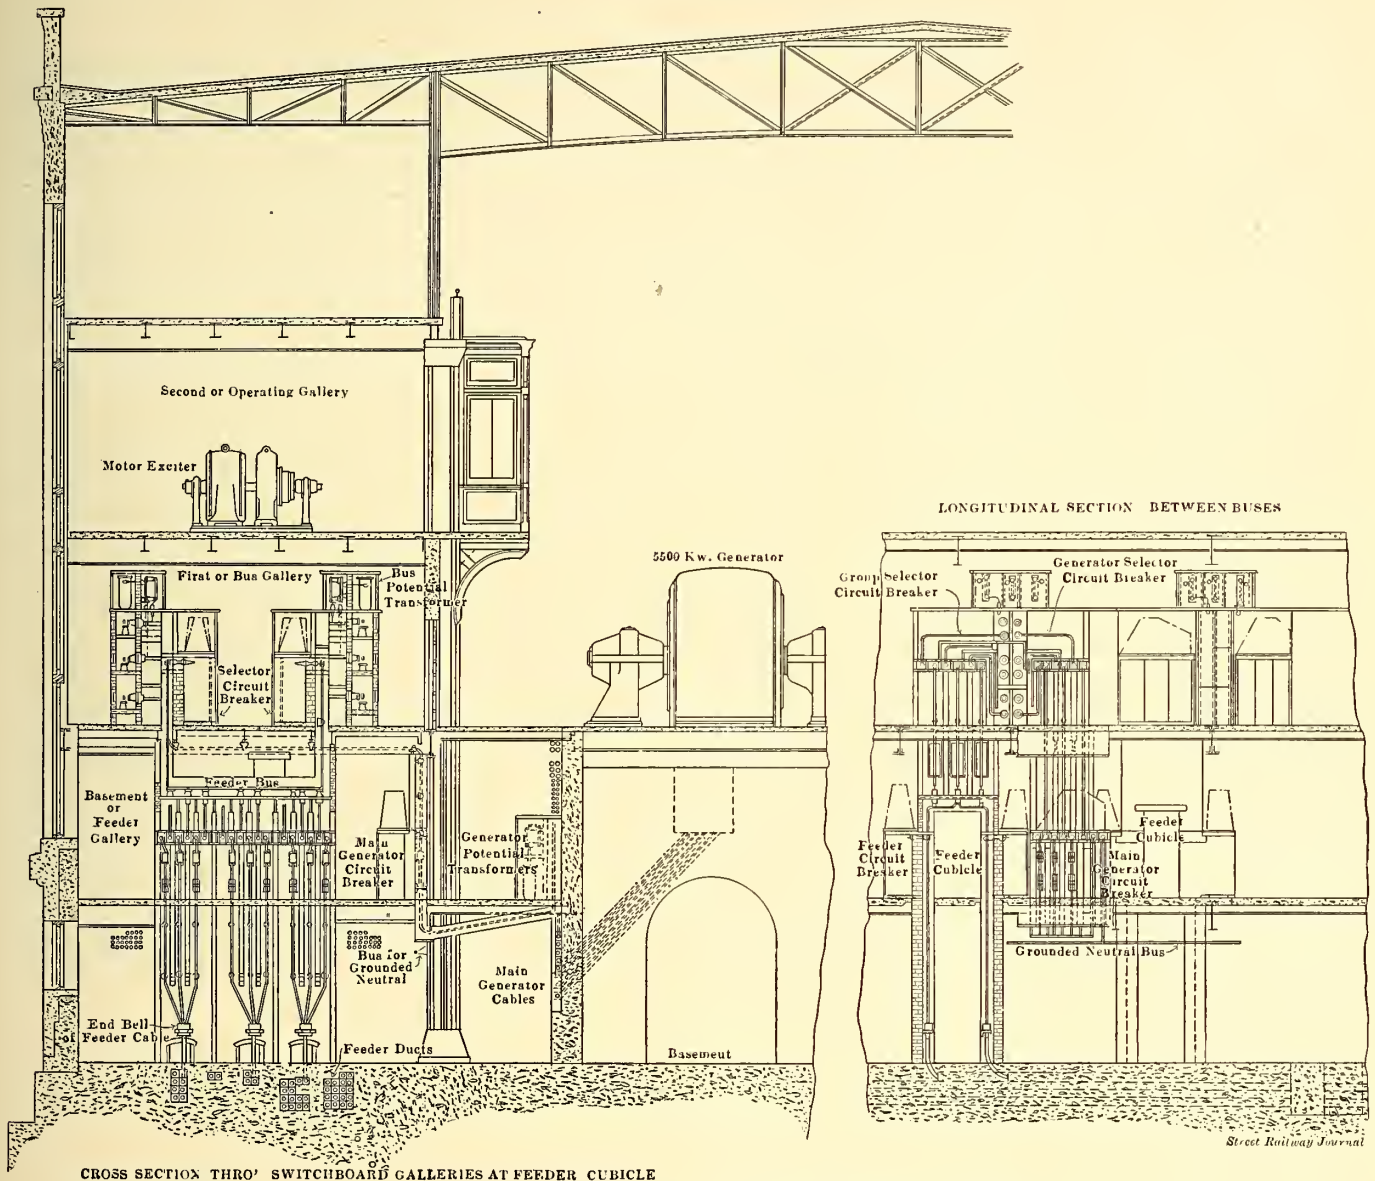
SECTIONAL ELEVATION OF SWITCHBOARD GALLERIES
